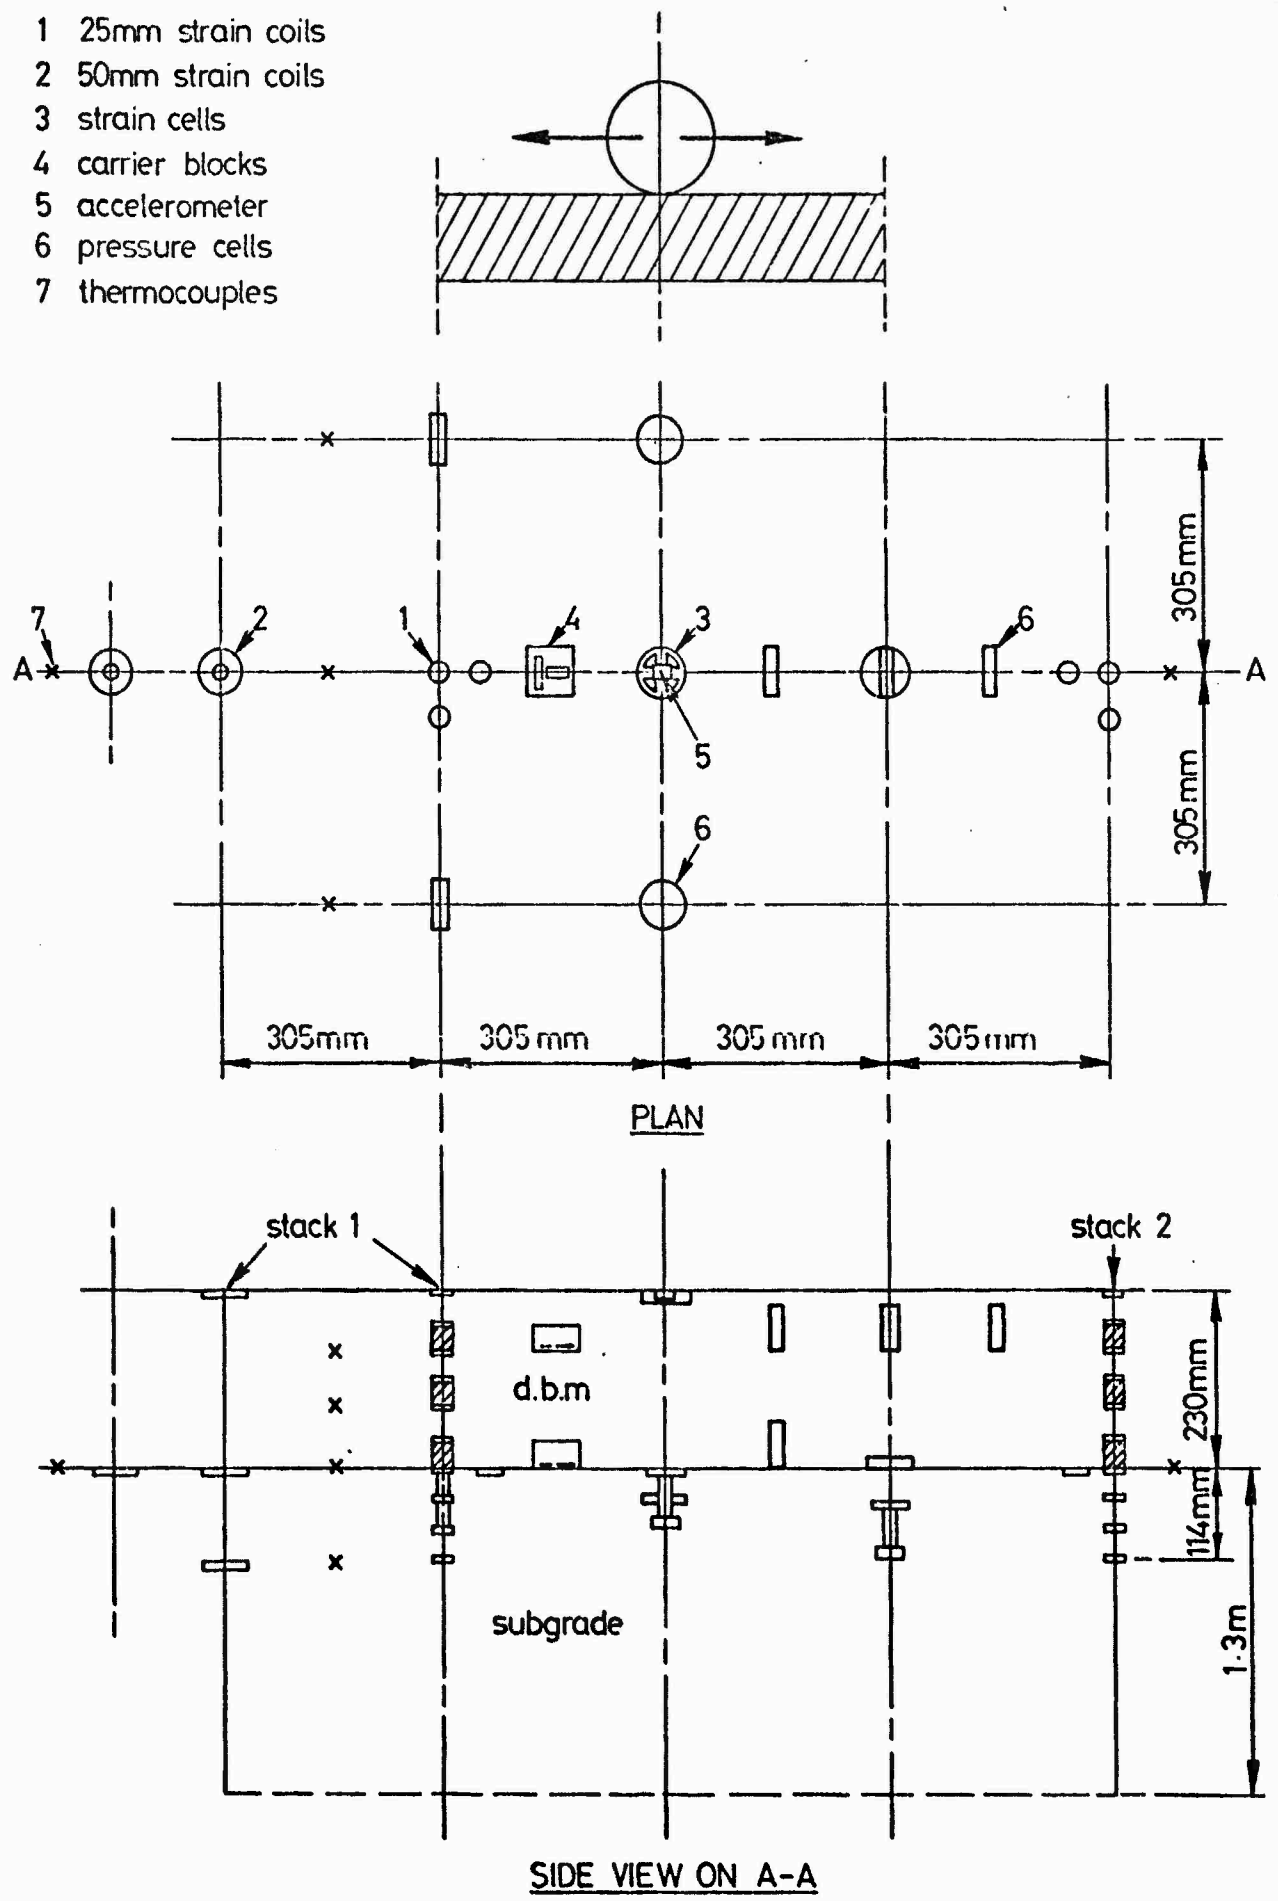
INSTRUMENT LAYOUT, PAVEMENT NO. 3
